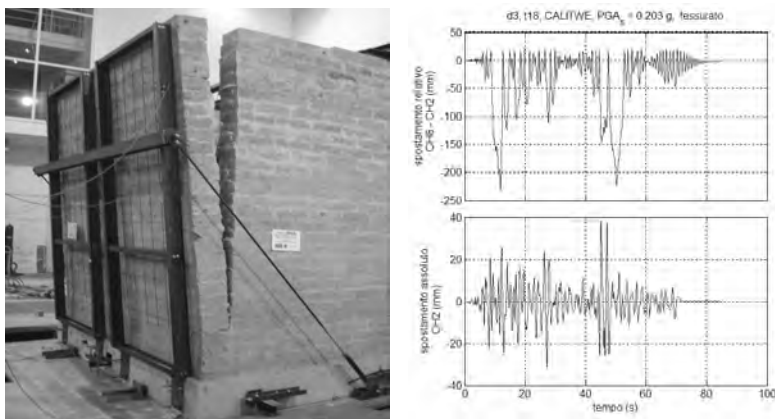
Shaking table tests on out-of-plane behaviour of a wall leaning against transversal walls.
